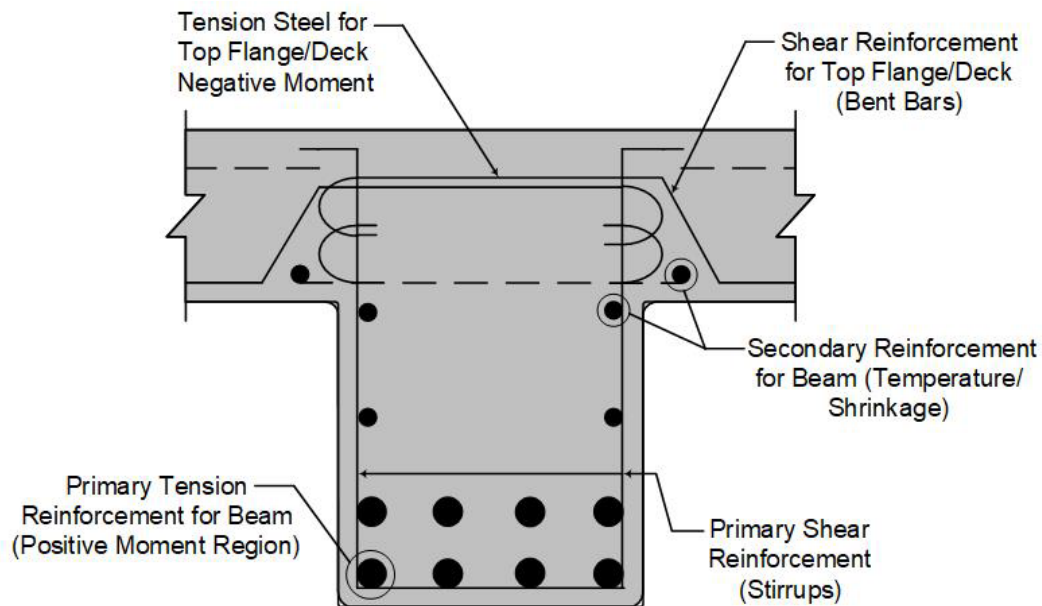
Cross Section - Steel Reinforcement in a Simple Span Concrete Tee Beam
